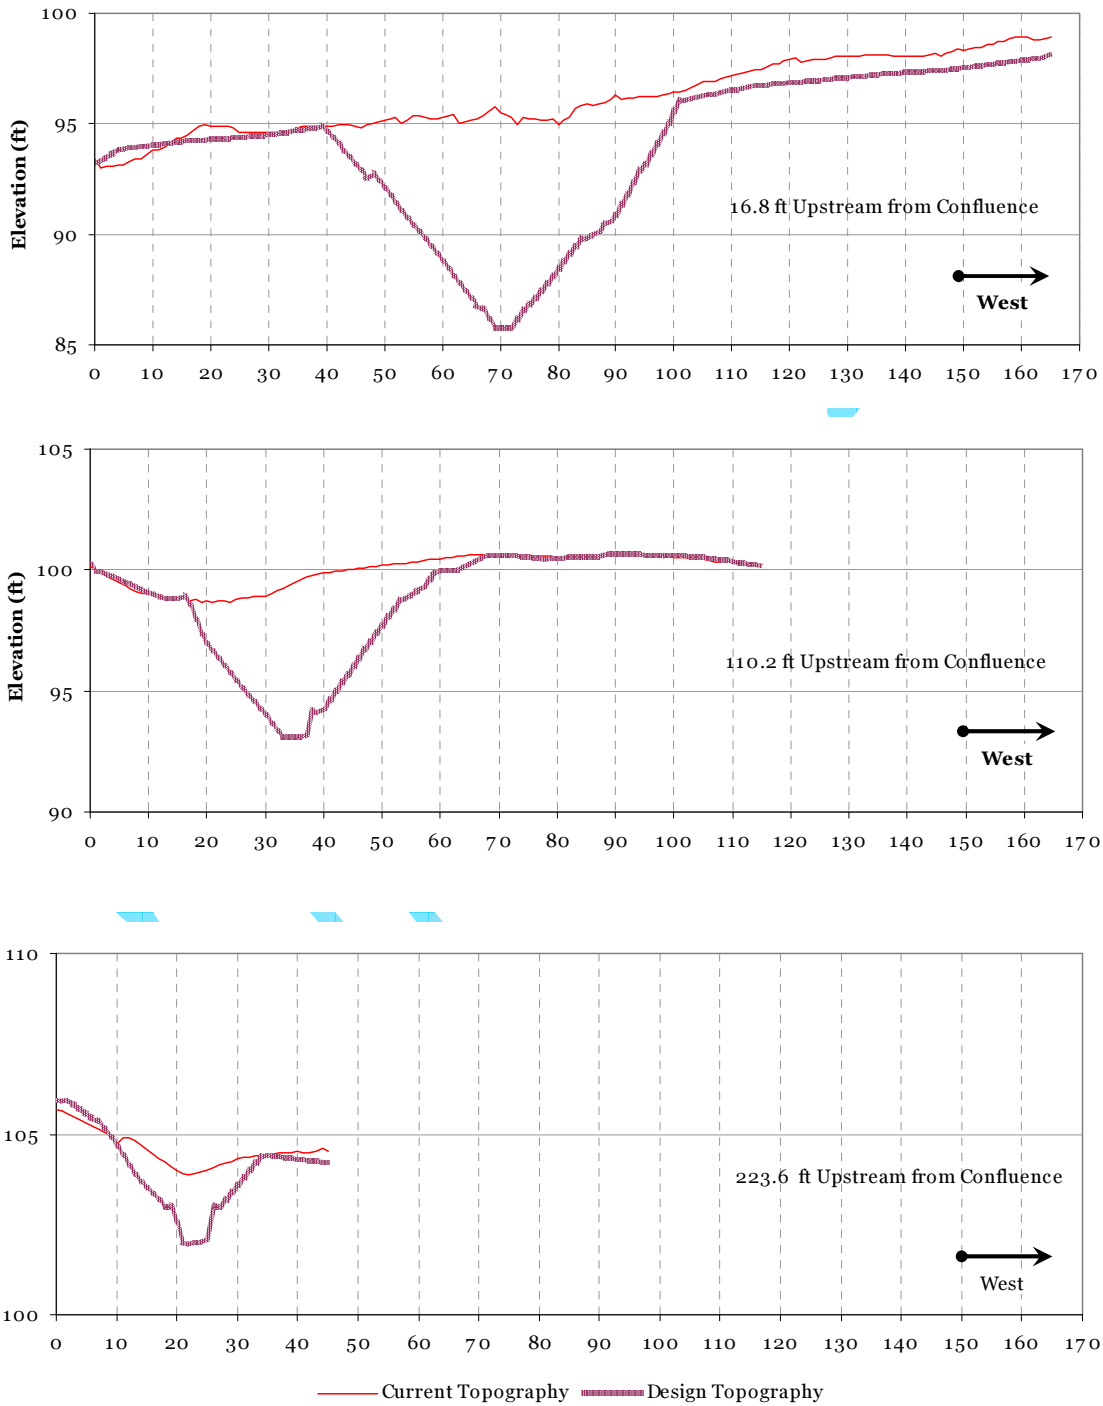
Cross-section profile of design channel with before and after topography. More cross-section profiles are available on request.
